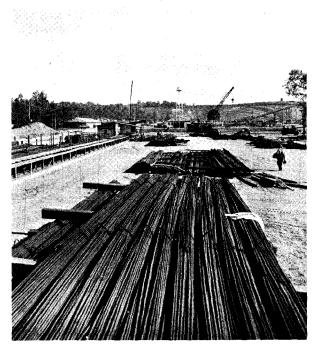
Steel reinforcing was stacked on either side of a roller conveyor on which it was moved to the shearing and bending machines located at one end of the stock piles.
